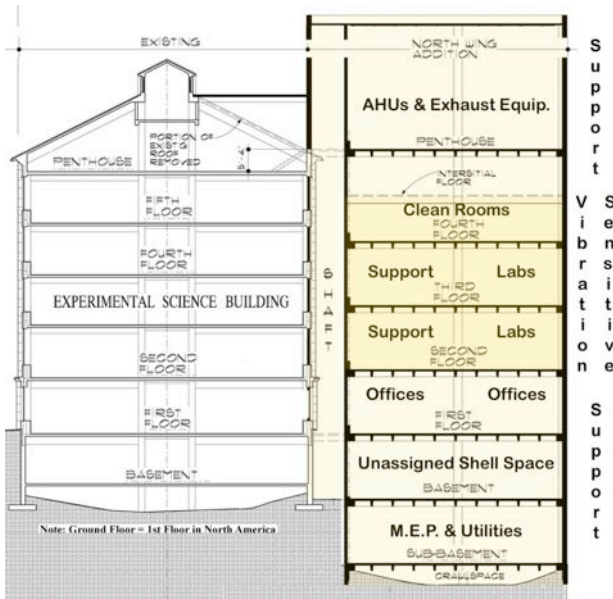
B. Section: Nano Science Addition to Existing Building. Research Floors are Separated from Building Systems.
